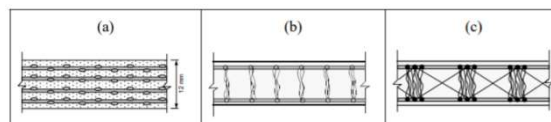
Sections of TRC: a) layers of 2D textiles reinforcements; b) and c) one layer of 3D textiles reinforcements. Source: [6].
